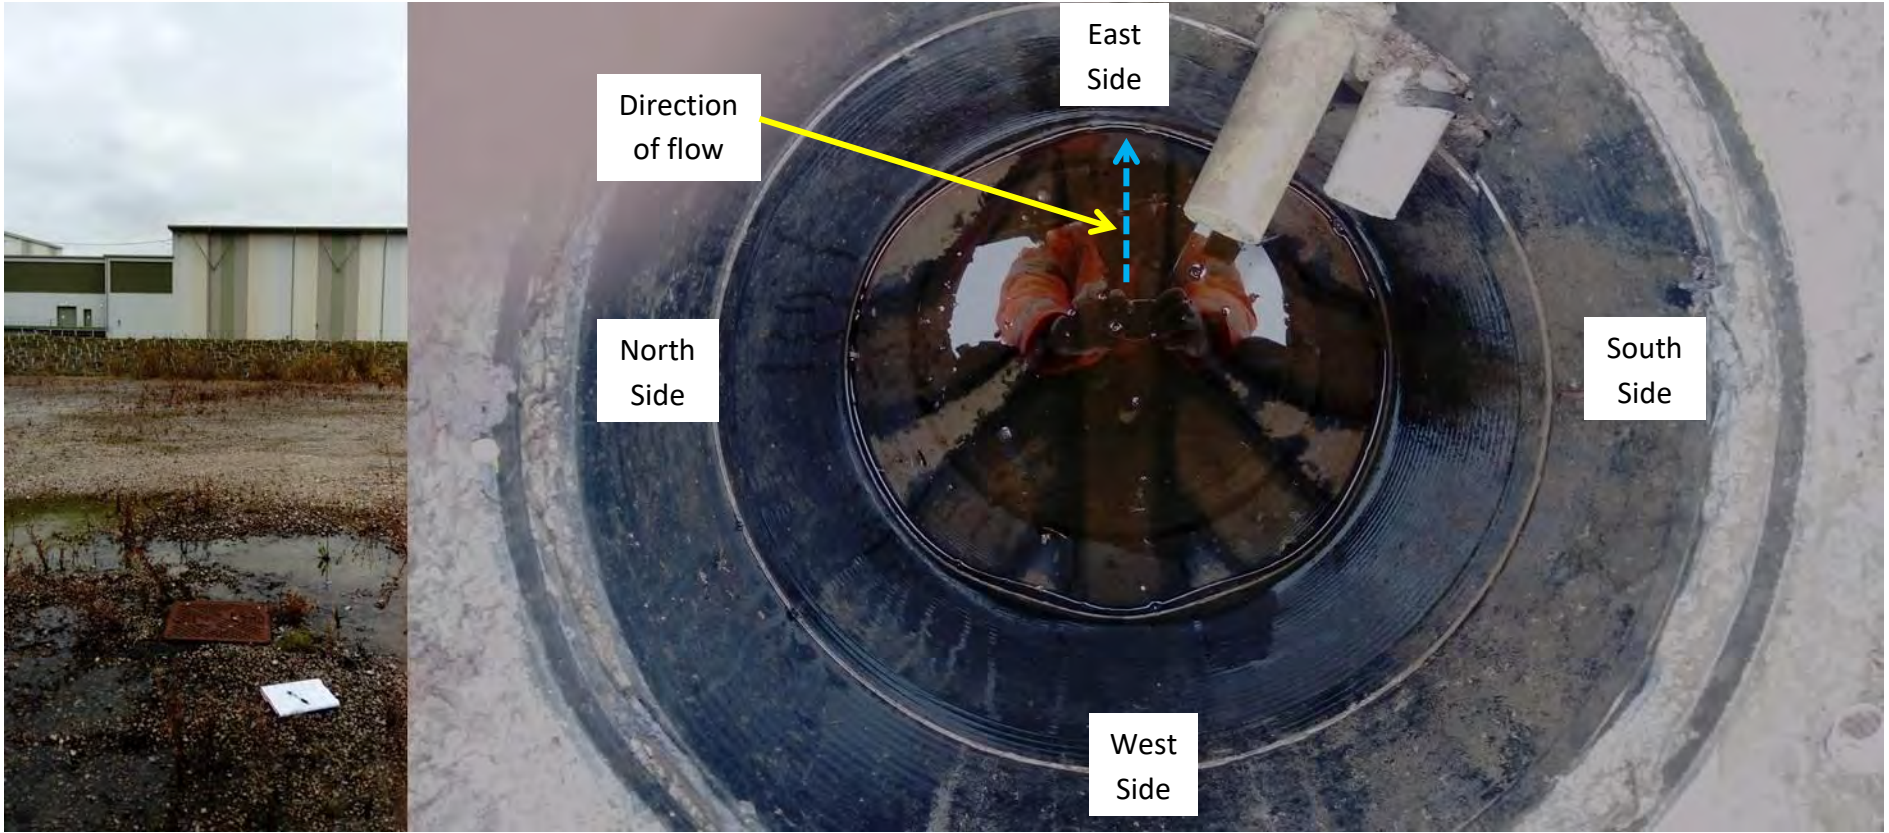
Previous potable water supply and foul water drainage in the elevated area located in the south-western corner of the site.
